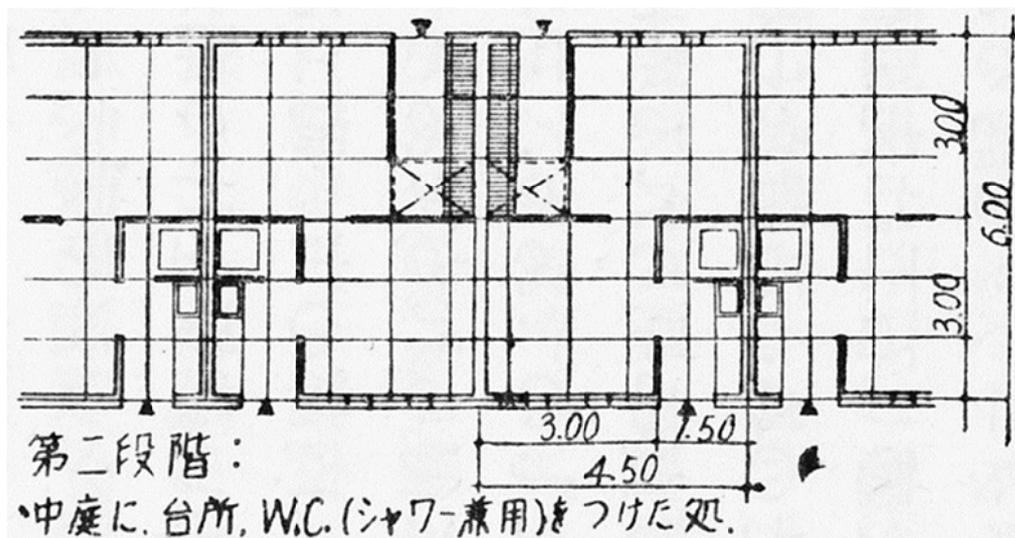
Floor Plan (second step) of a house with a patio equipped with a Kitchen and a W.C.
